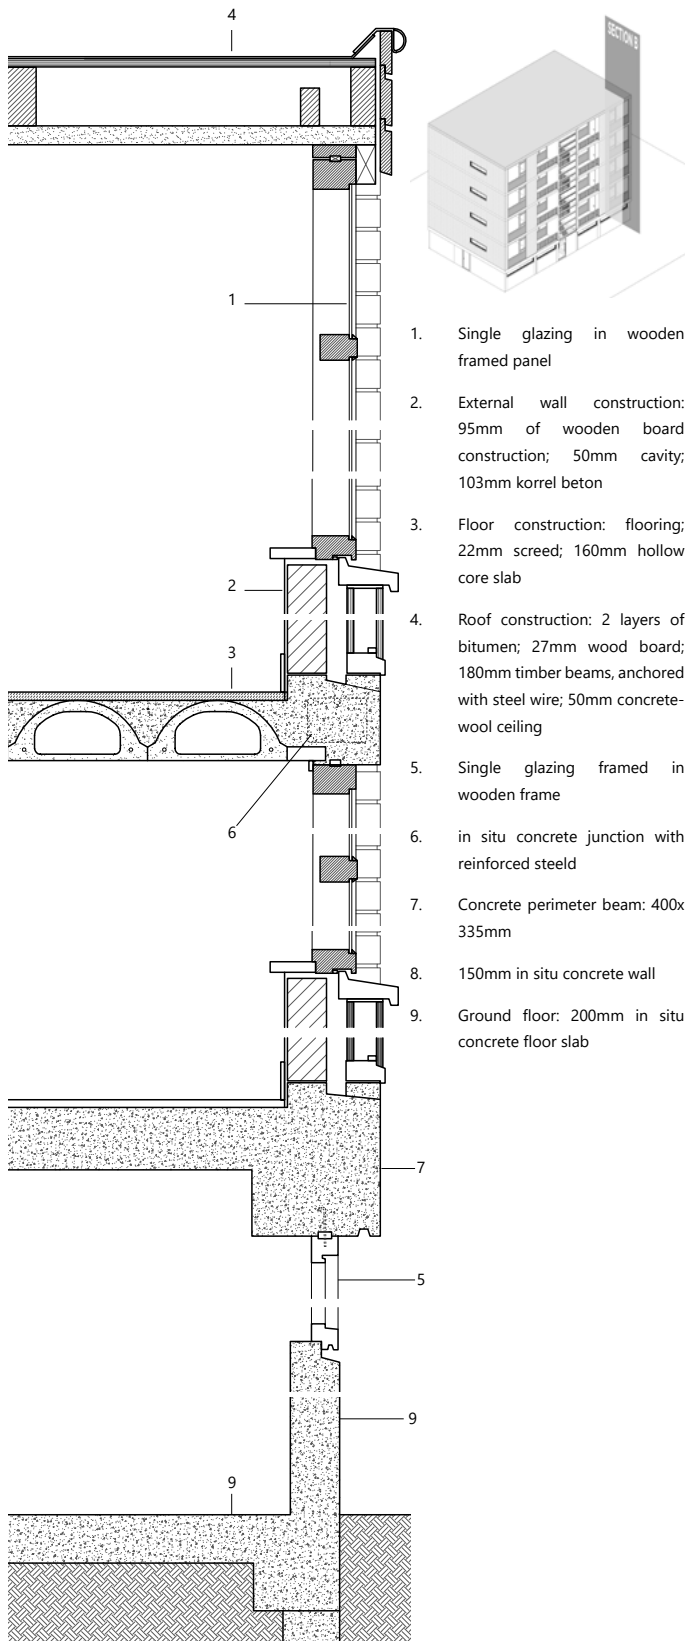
detailed section through west elevation (1:20) redrawn from archived drawings.
